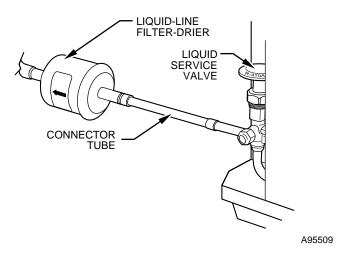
Filter Drier with Sweat Adapter Tube and Liquid Tube
